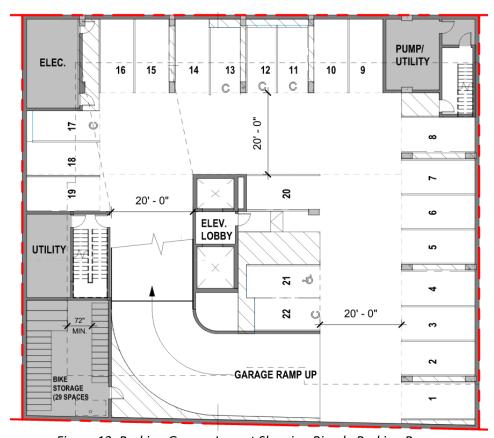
Parking Garage Layout Showing Bicycle Parking Room
